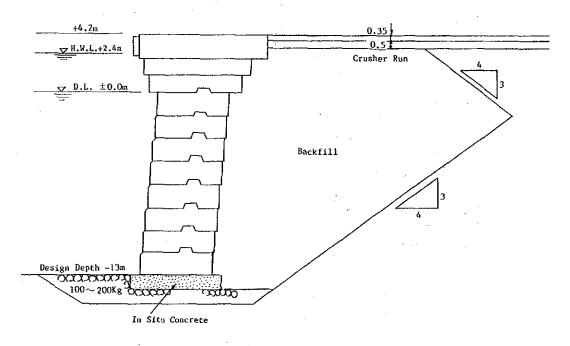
Proposed Cross Section of the Berth (-13m)
